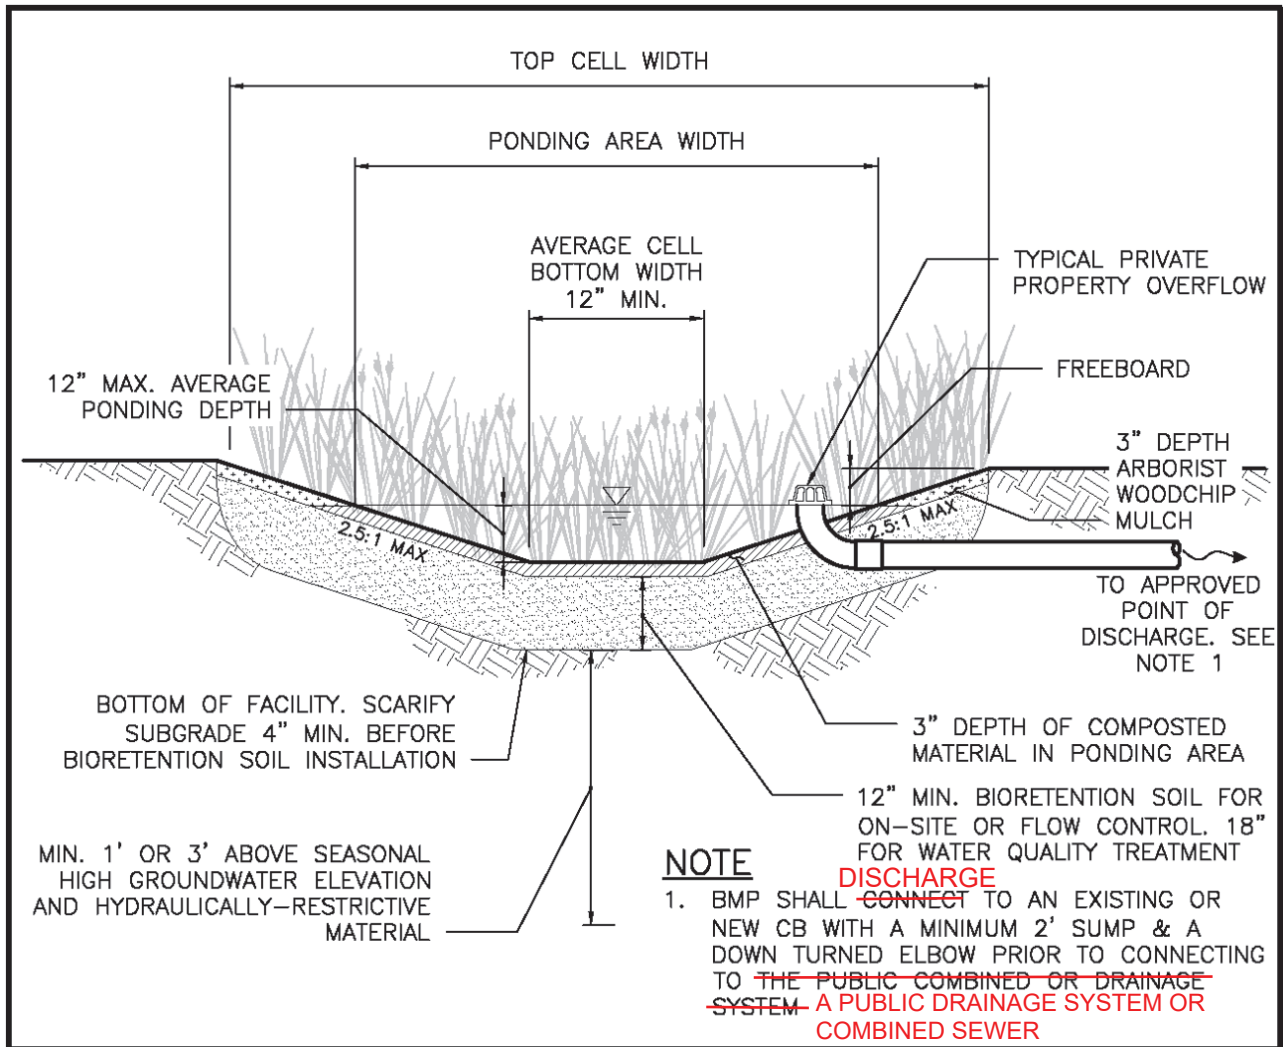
Infiltrating Bioretention Facility with Sloped Sides (without Underdrain).
